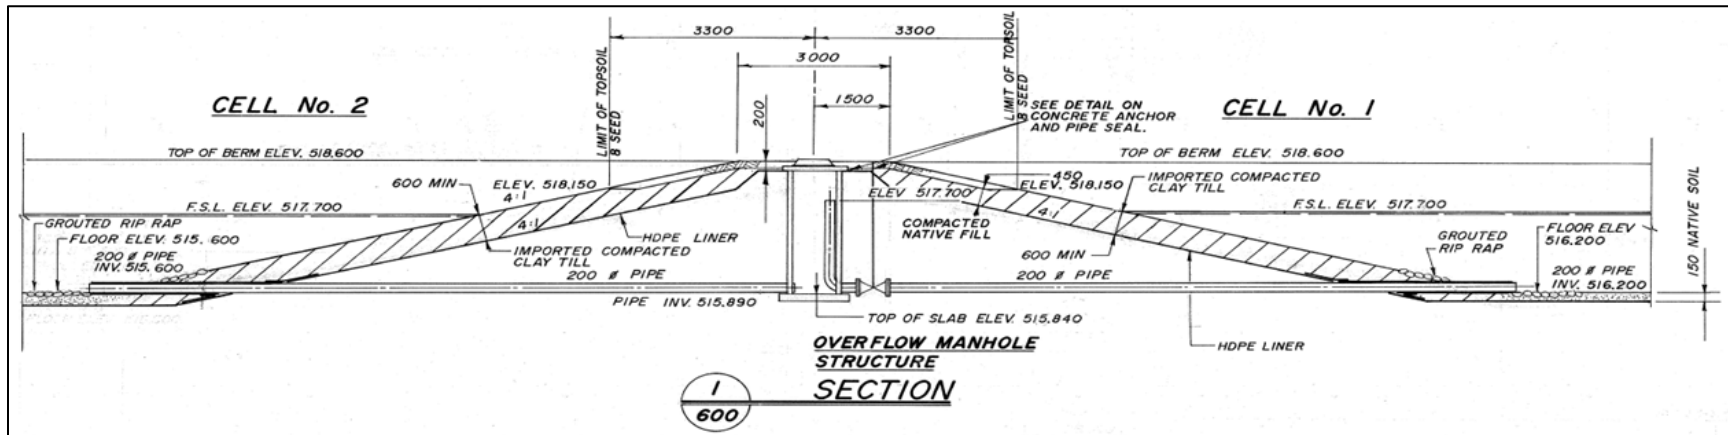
1988 Construction drawing - Cross section of central berm (Modified from Bullée Consulting Ltd. 1988b)
